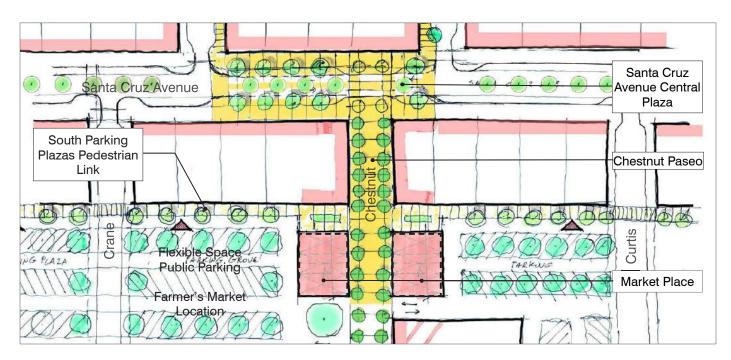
Concept Plan of South Parking Plazas Pedestrian Link
